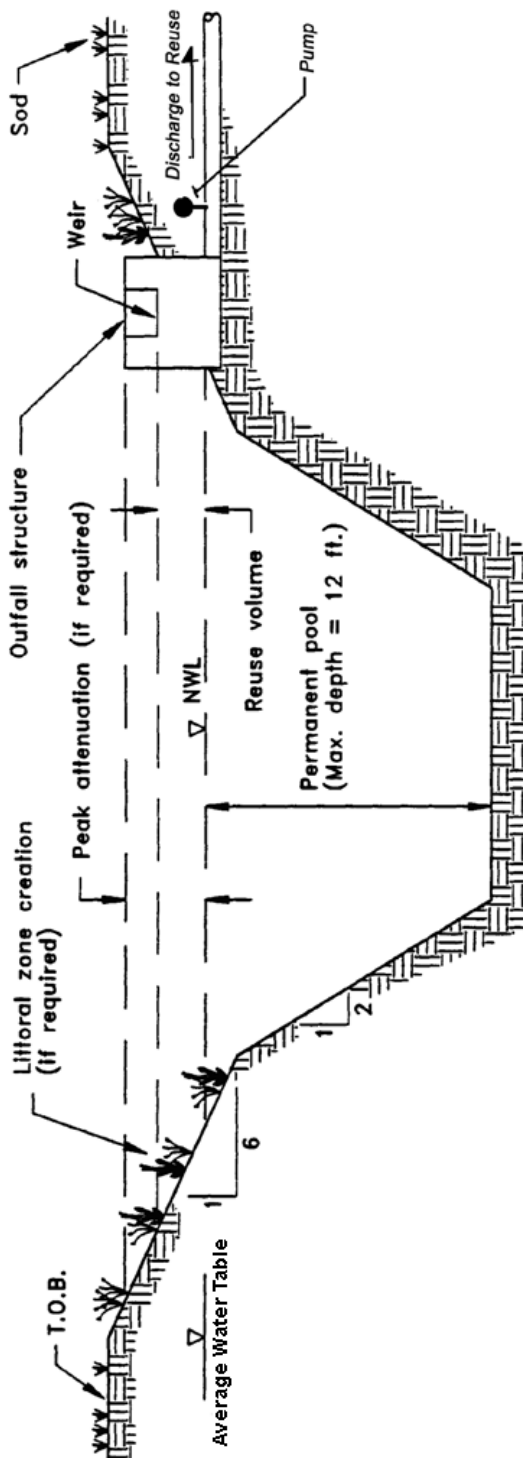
1 Typical stormwater harvesting system (N.T.S.).
